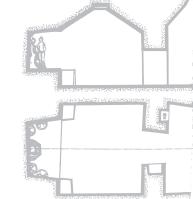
| Cross section and layout of Cave 220, Dunhuang, originally built in 642 c.e.
